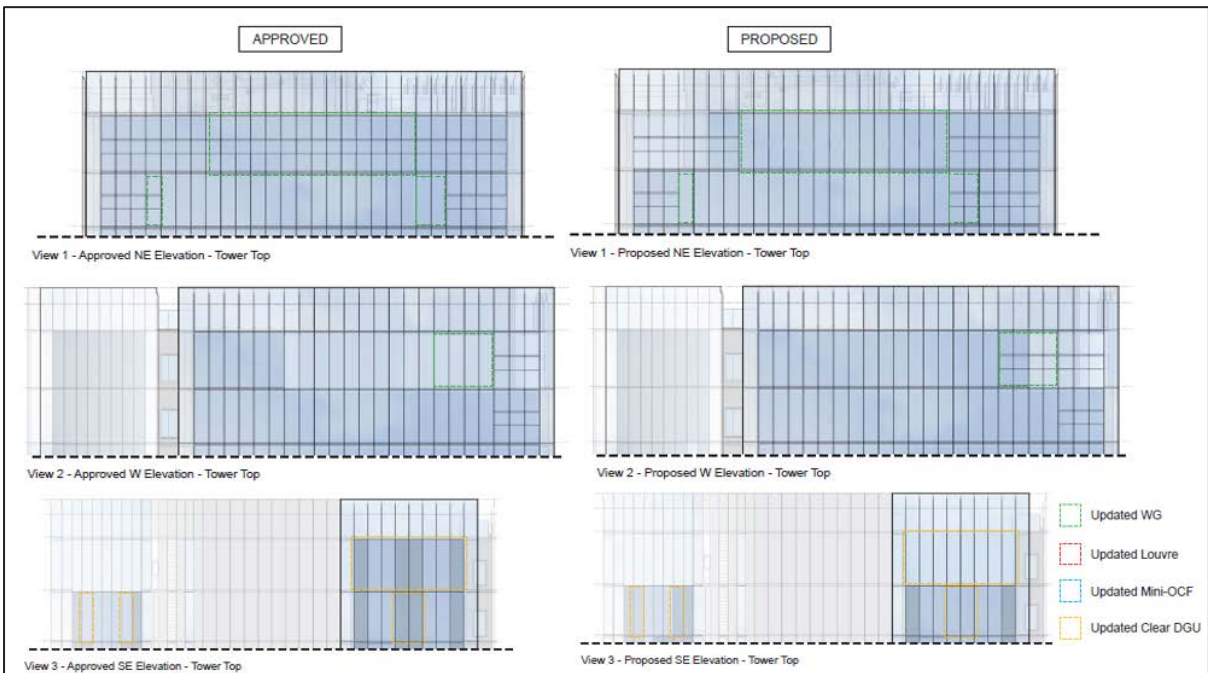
| Façade modifications at levels 56 and 57 (Base source: Applicant's Design Report)
